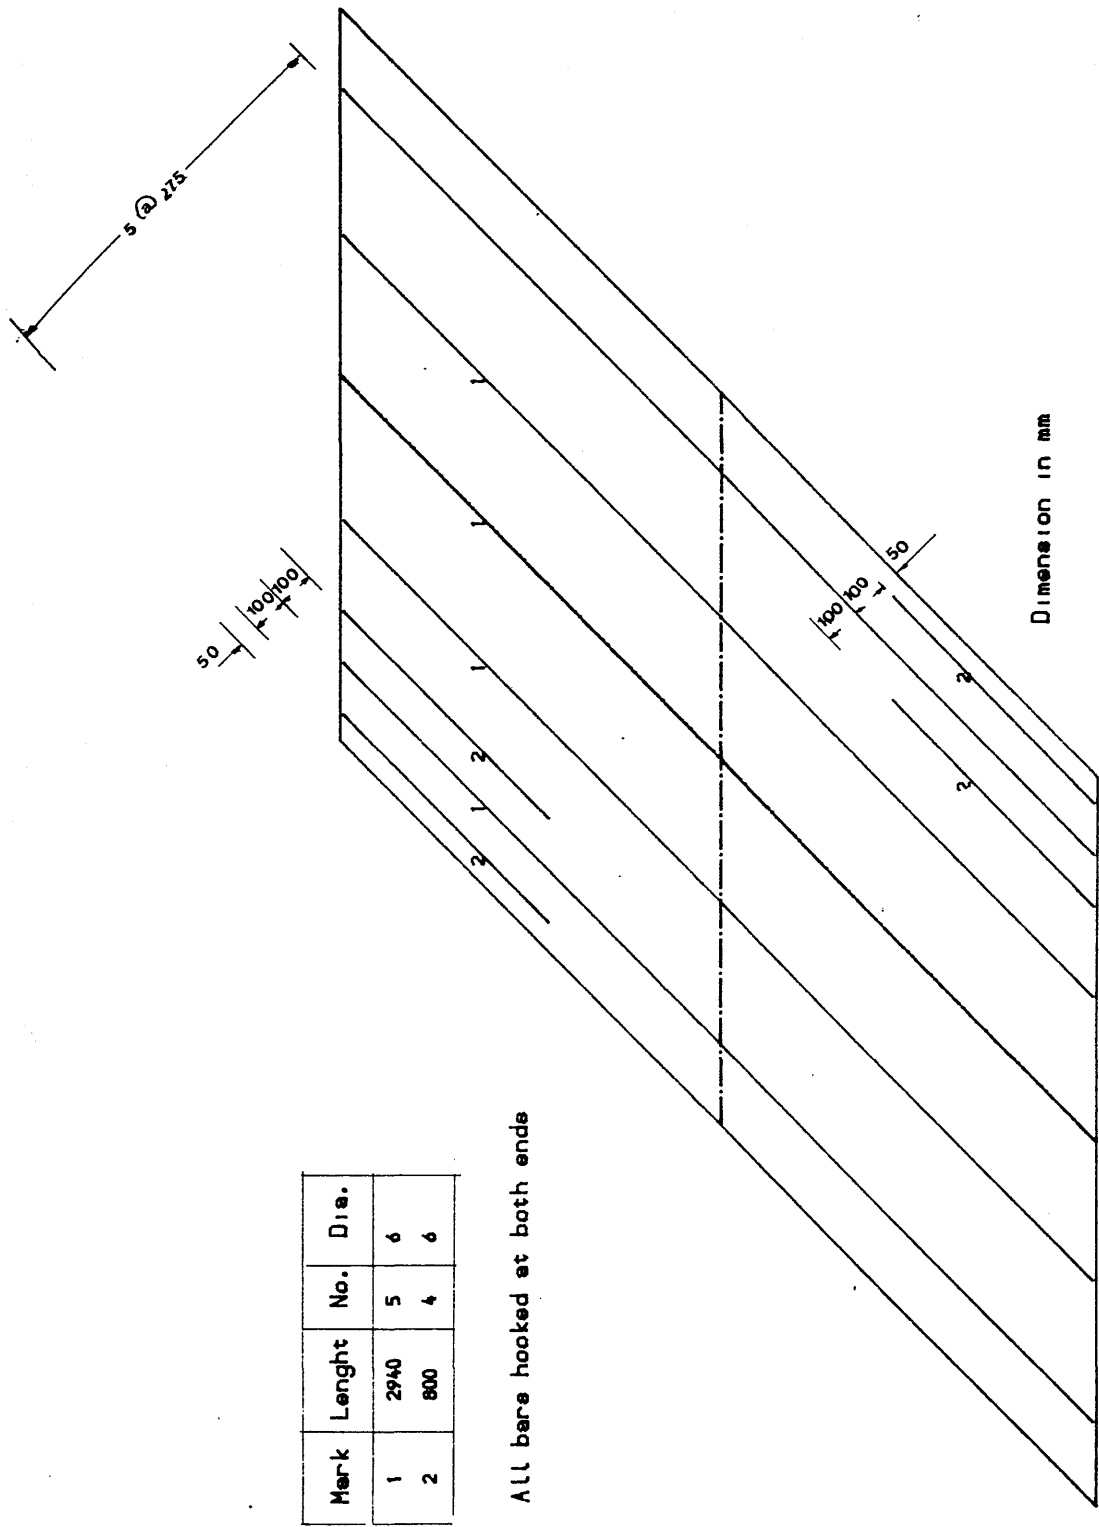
2) MODEL SKEW SLAB NO. (5) Details of bottom longitudinal steel parallel to the free edge.
